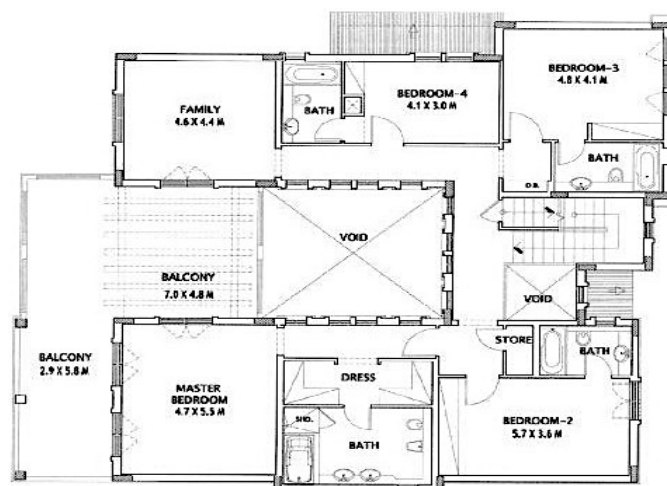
Case study Valencia villa,first floor.Source: [www.worldfloorplans.com](http://www.worldfloorplans.com)
